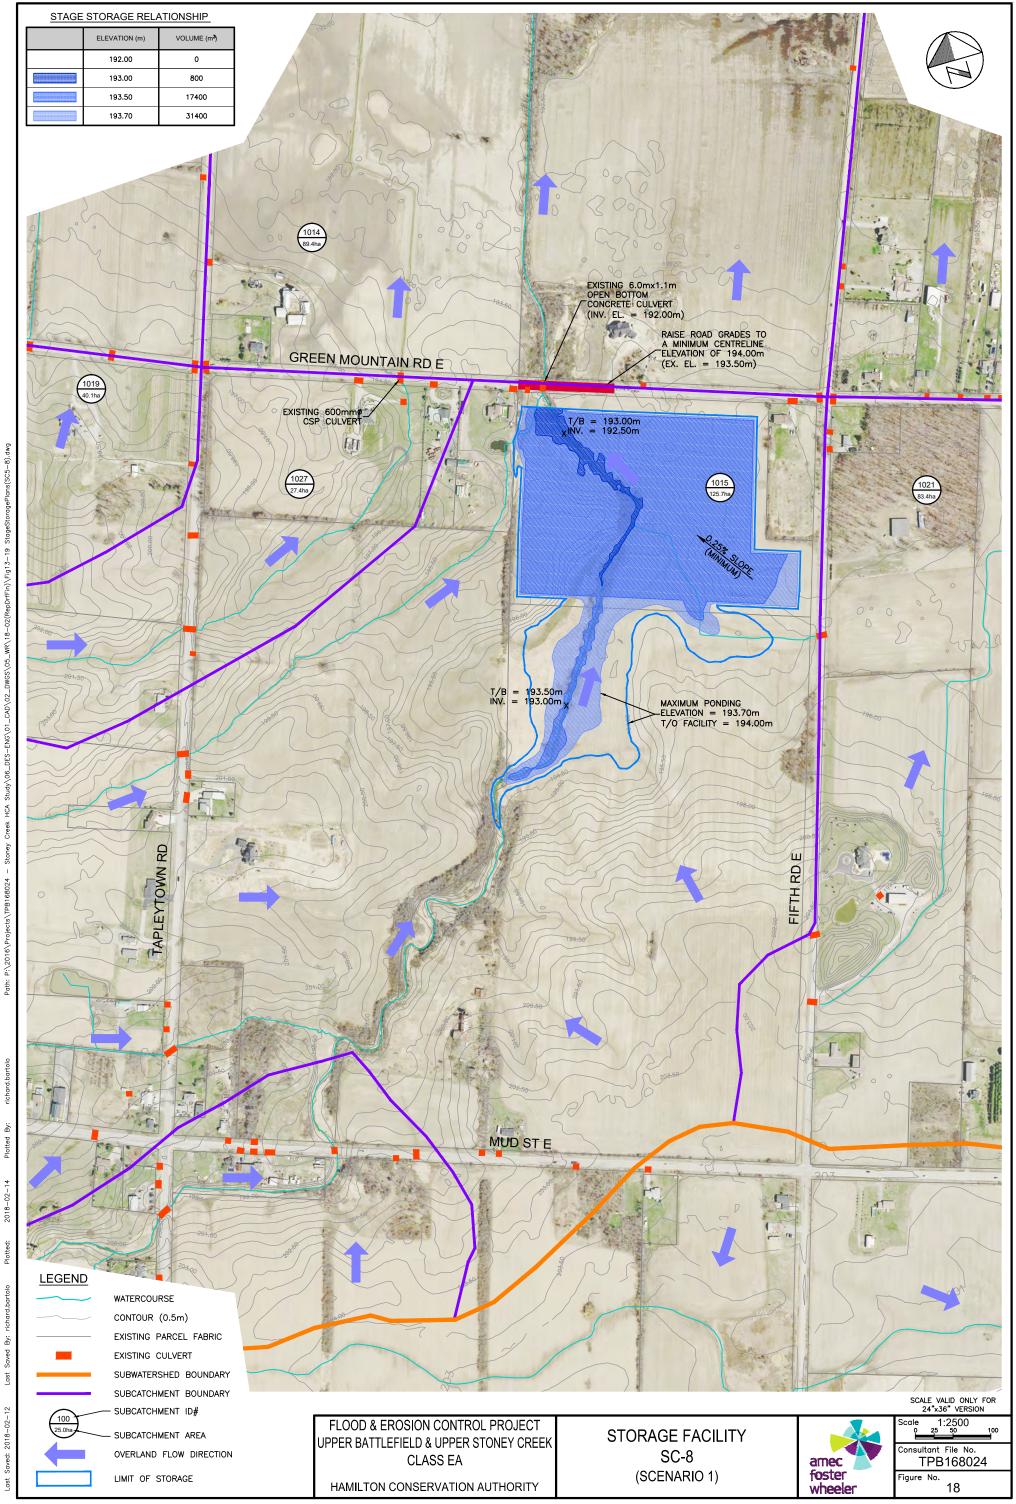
shows the proposed SC-8 wetland facility as envisioned by the previous study. The proposed facility would use the existing 6.0 m span by 1.0 m rise concrete box culvert on Green Mountain Road East as the ultimate outlet for the proposed SC-8 facility. However, due to the limited depth of storage, it was proposed to raise the road by 0.5 m to 194.00 m or create an equivalent standalone berm upstream of the crossing. Approximately 100 m of road would have to be raised. The maximum elevation and depth of storage would be 193.70 m and 1.20 m based on providing 0.30 m to freeboard to the Green Mountain Road East. No excavation was envisioned to achieve storage requirements. Portions of the ponding would be within HCA's property, but portions would also be on non-HCA property. The total storage envisioned would be 31,400 m³ in a single, on-line facility.
